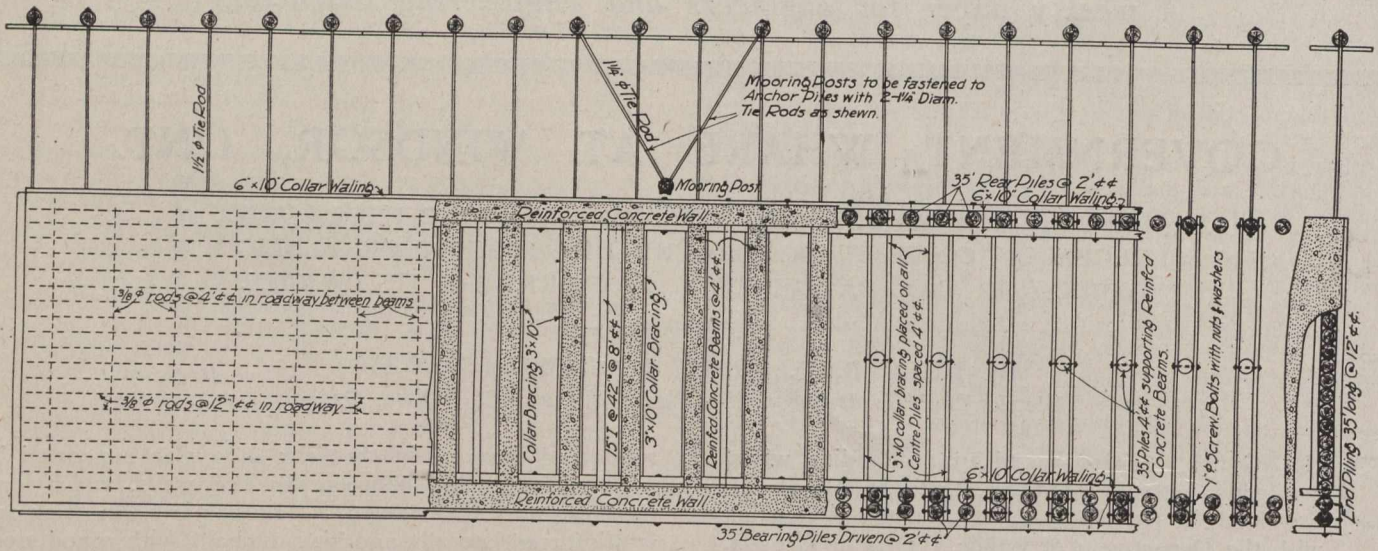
Plan of Roadway Reinforcing, Beams, Piling, Collar Waling and Bracing.
